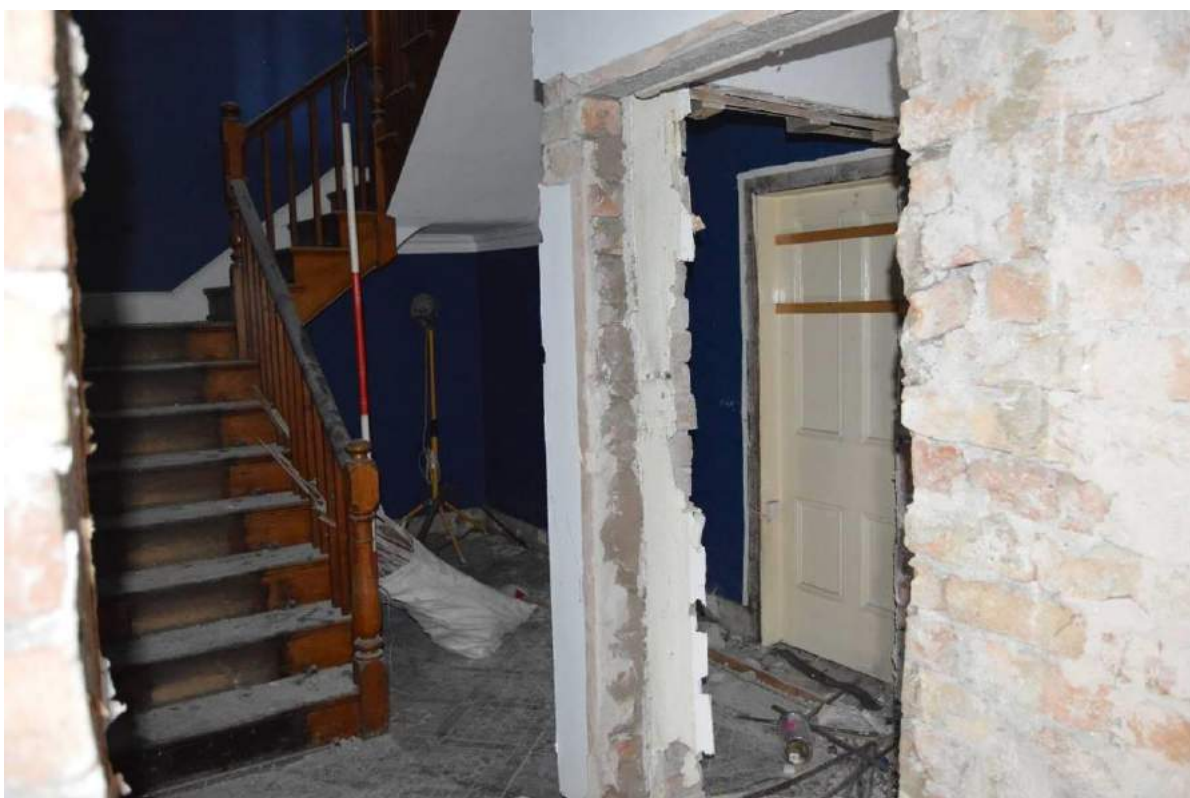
View towards the stairwell. Note partition walls and the sealed doorway in the background (Scale: 1 x 2m).
